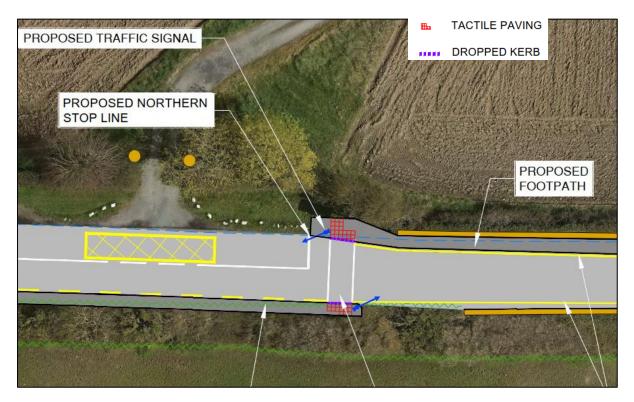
Preliminary design pedestrian crossing northern approach to bridge
